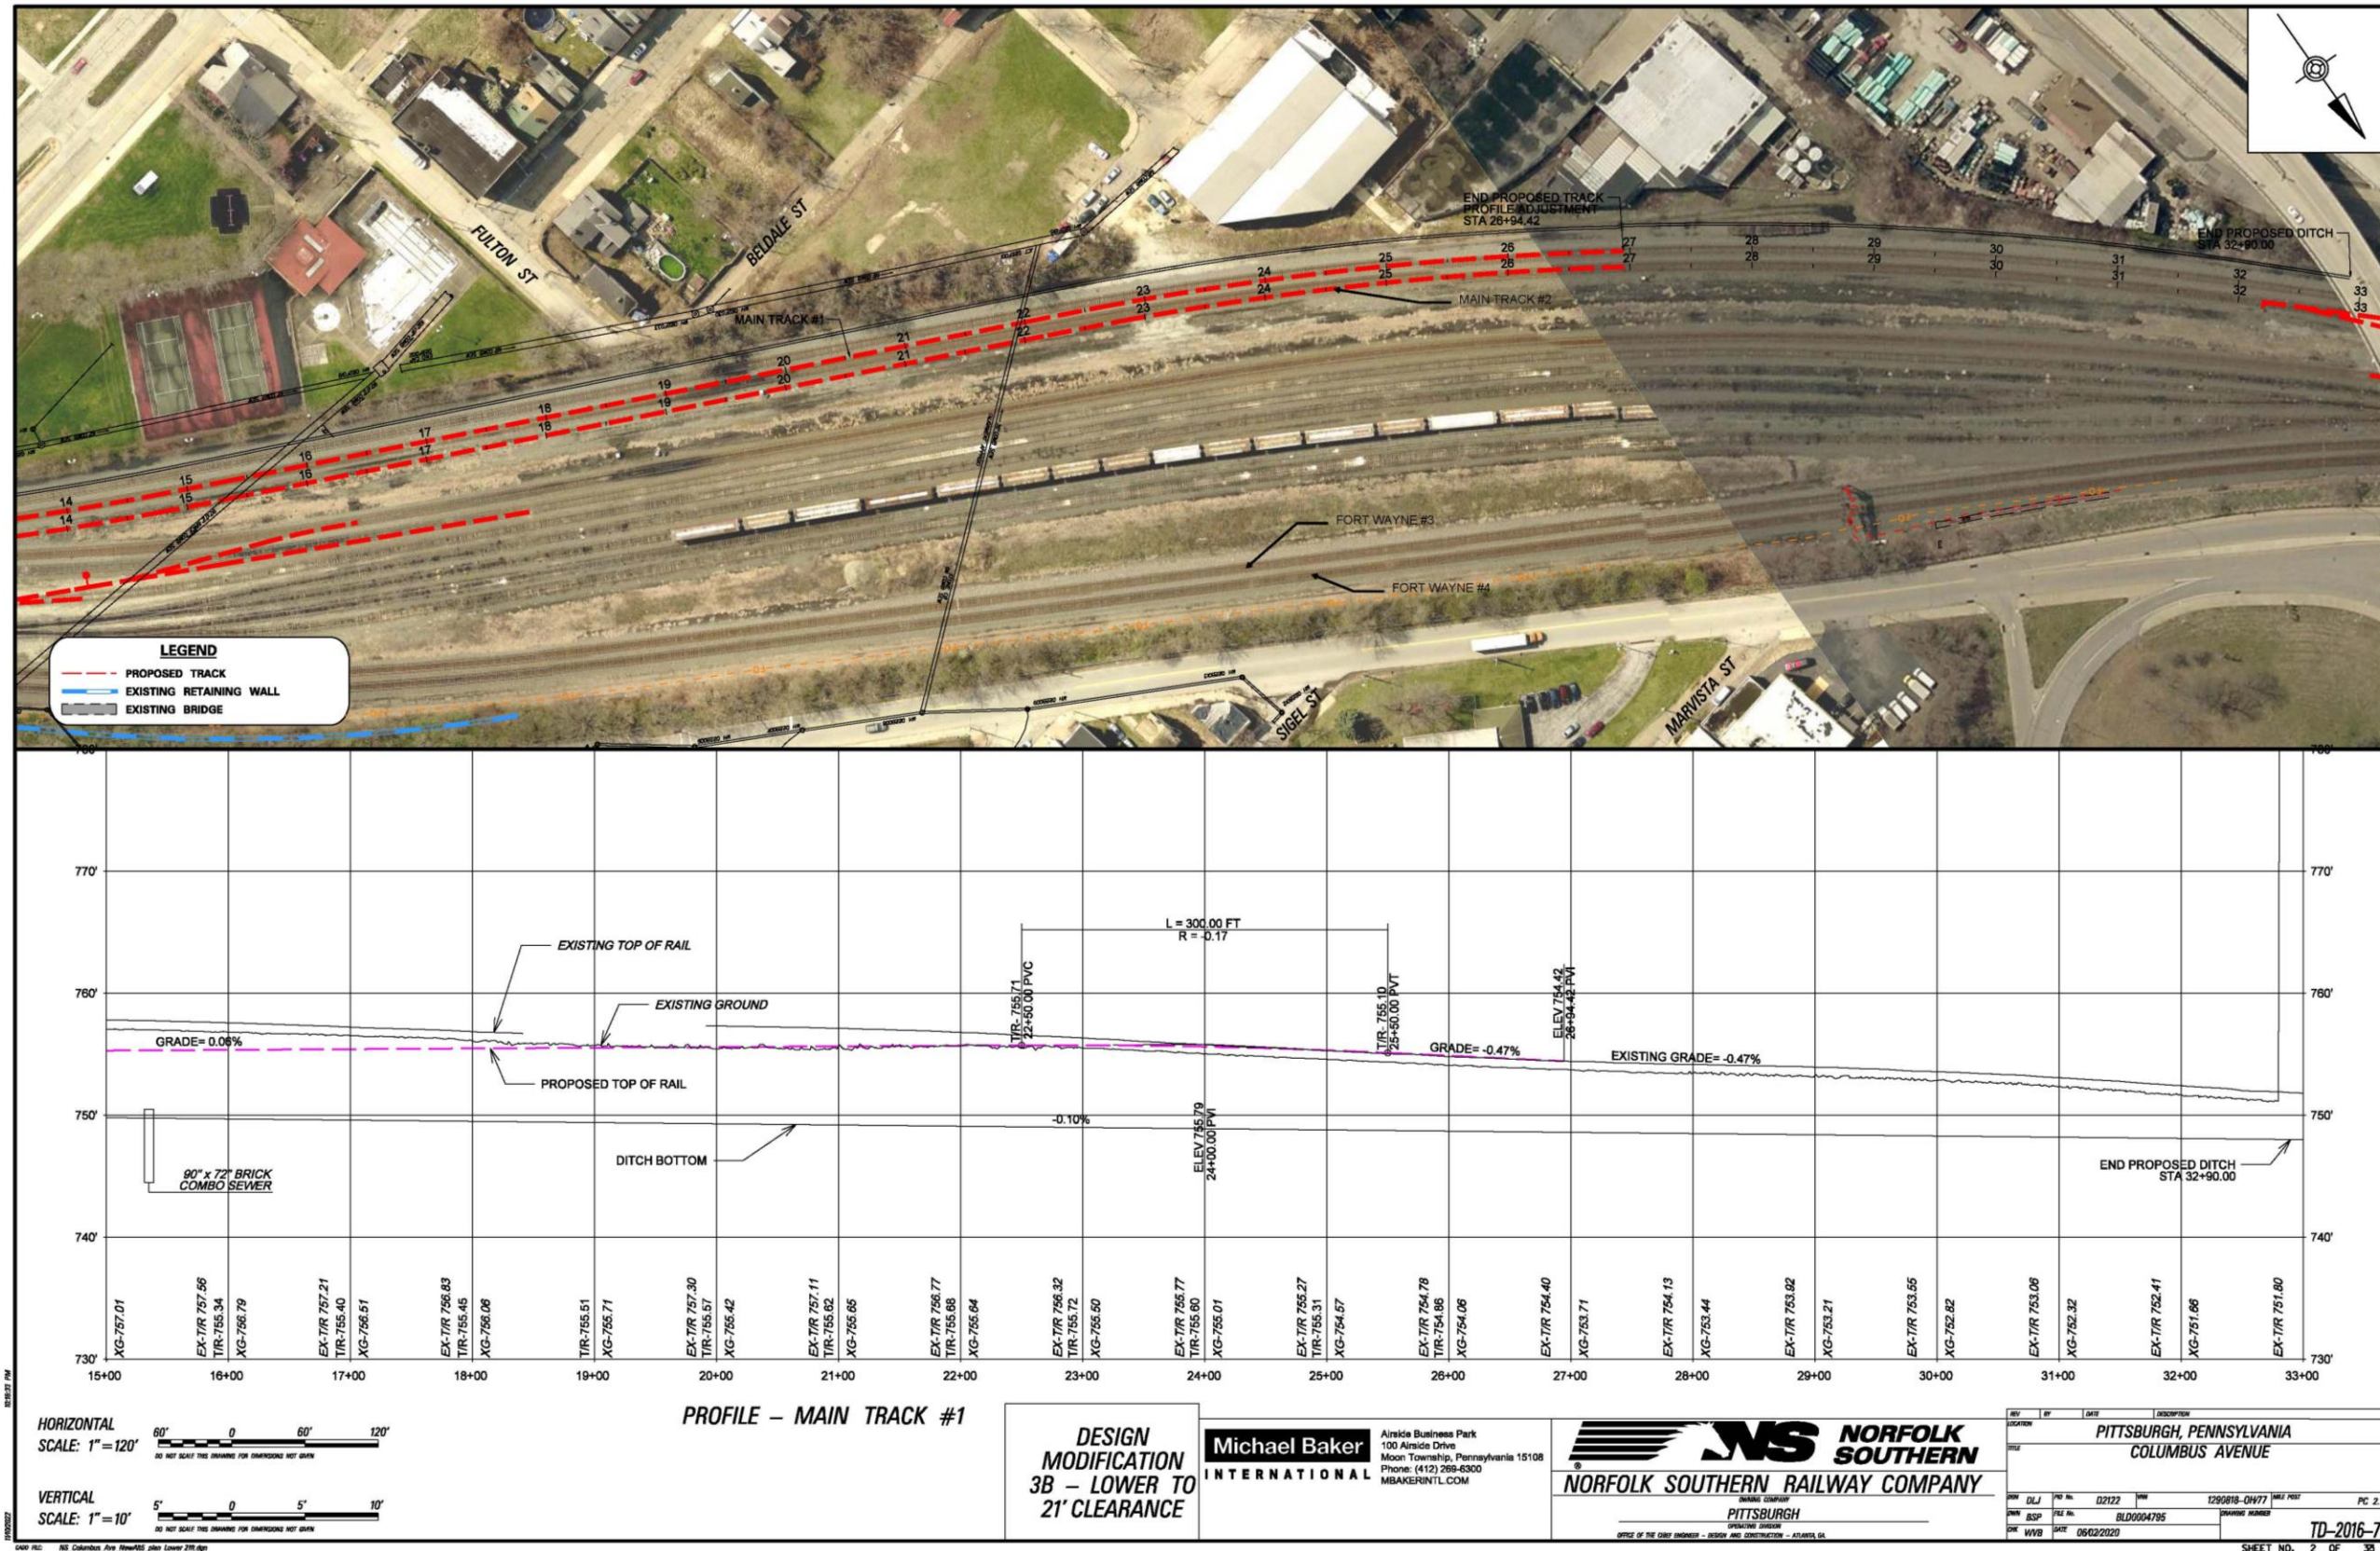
Plan and profile views of Alternative 3B showing area south of the bridge.
